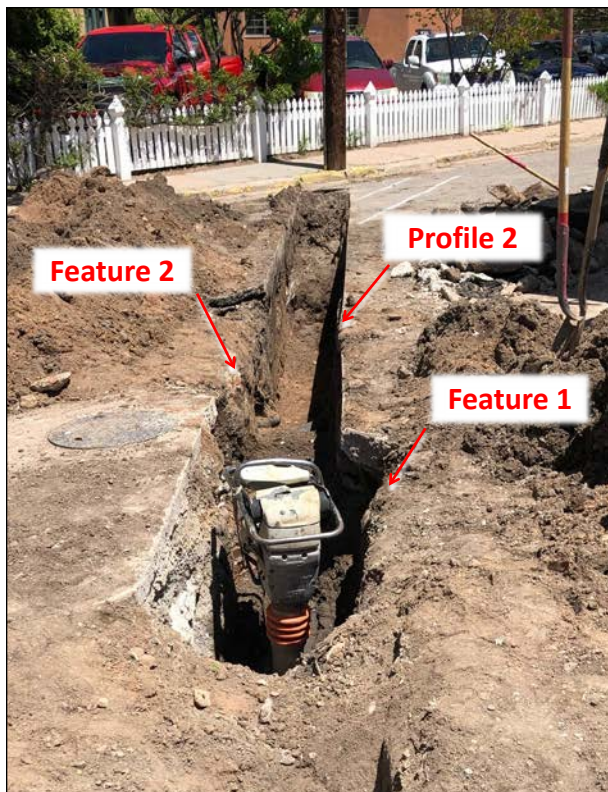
Trench 1 across McKenzie Street with Profile 2 location, view northeast.
